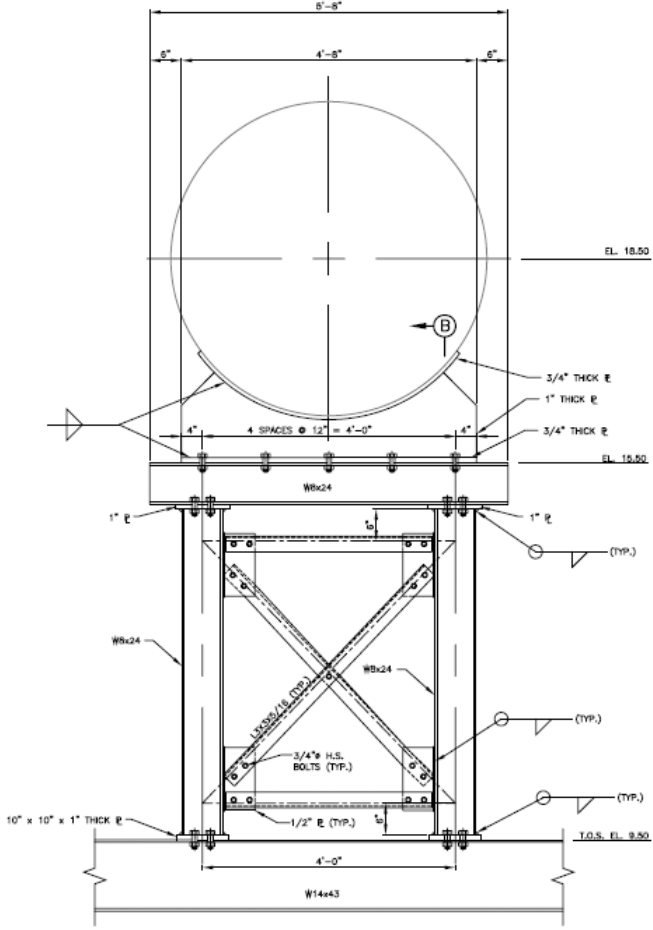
17th Street Phase 1 Discharge Pipe Support at Pump Platform
